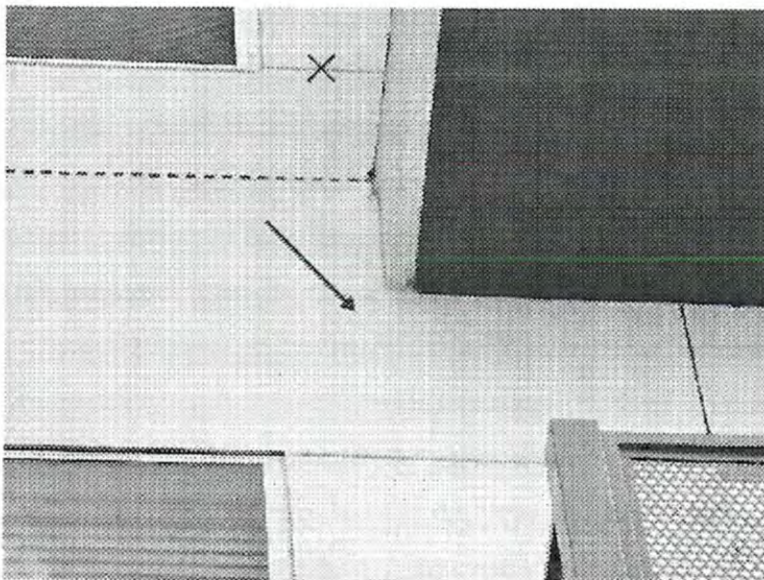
Cracking at balcony on Building A with horizontal control joint not at location indicated by revised layout.
